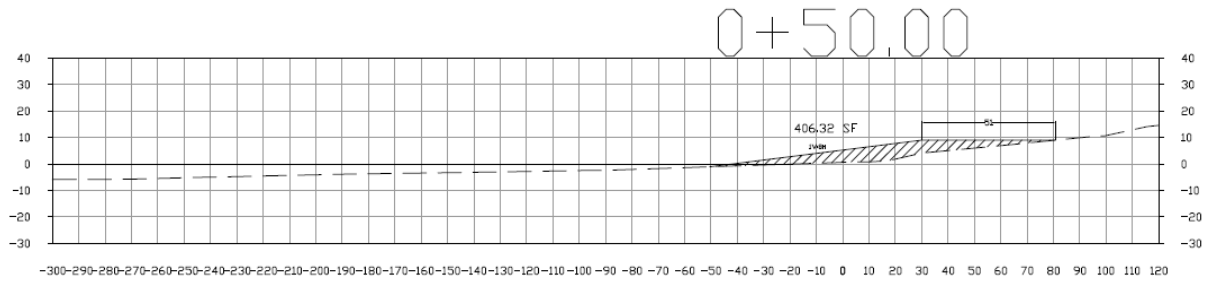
(a). Typical beach fill cross-section at Sta 0+50
